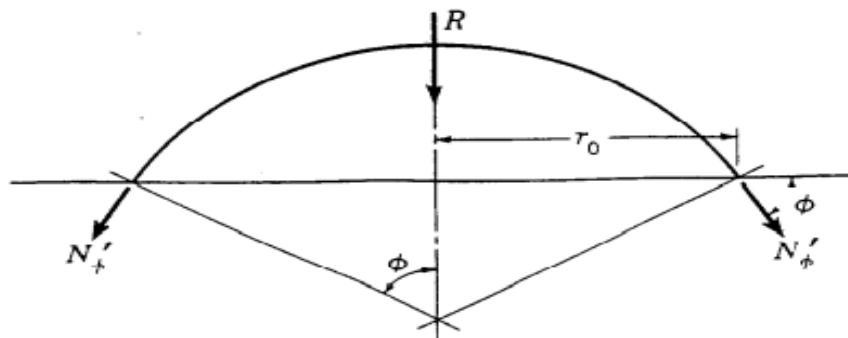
The integral load R causes concrete dome shell equilibrium (Billington, 1982).
